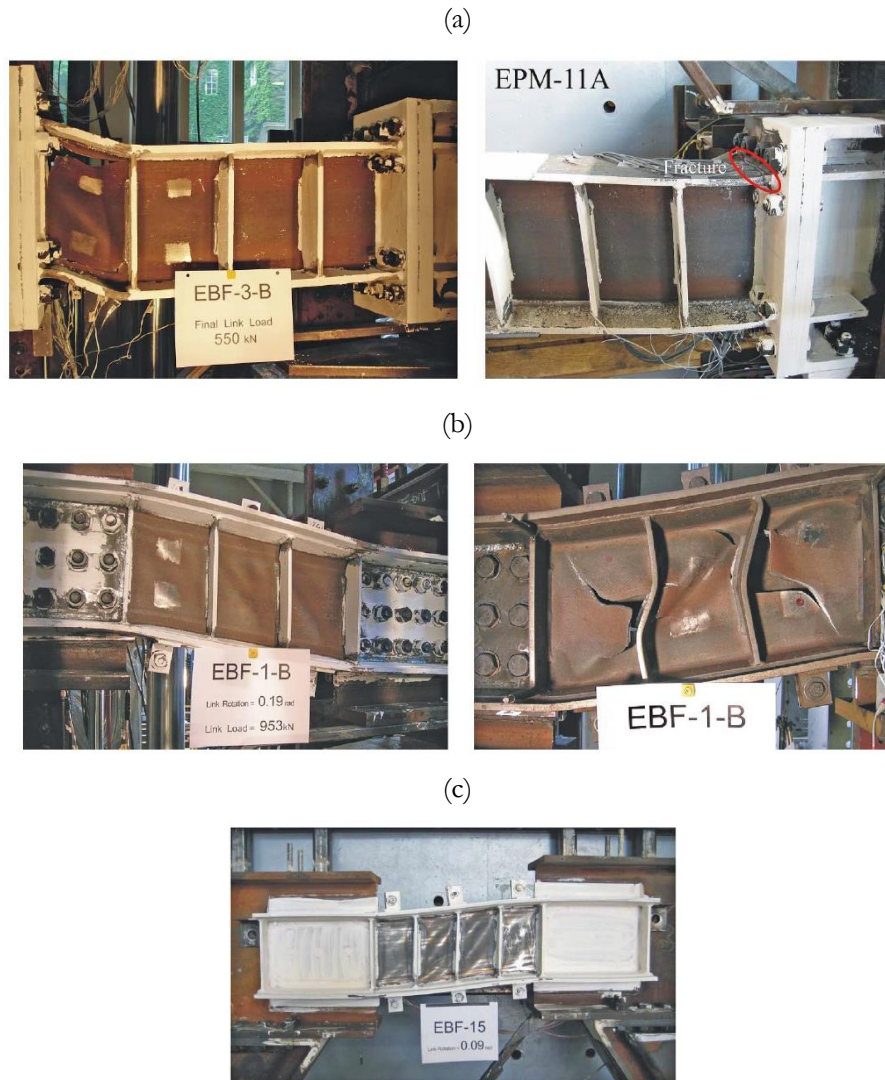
Eccentrically Braced Frames with the replaceable shear link [10]: (a) Bolted end plate, (b) Bolted web connection and (c) welded web connection
